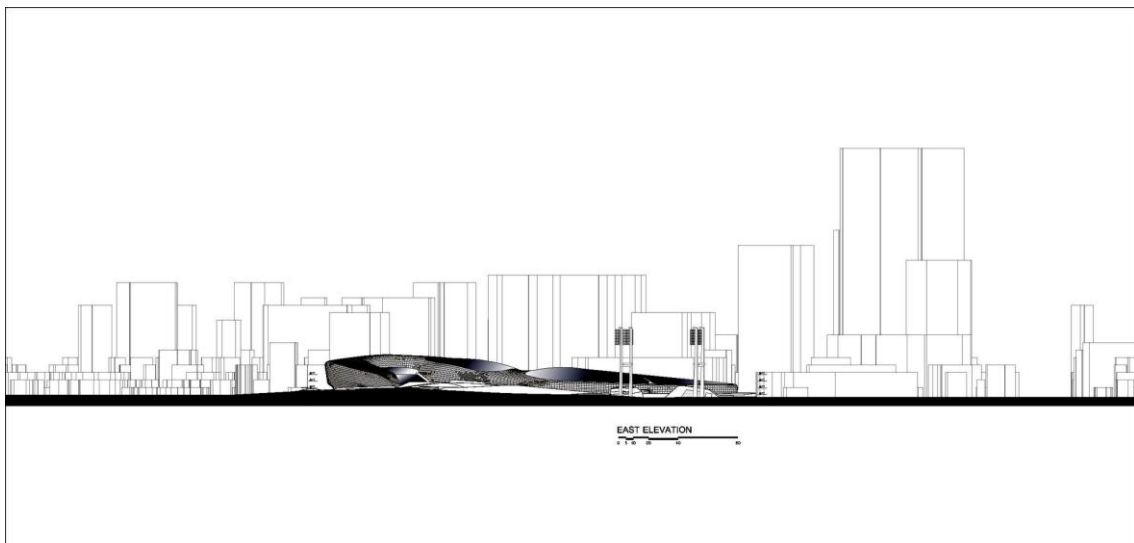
Dongdaemun Design Plaza East elevation.¹³¹
